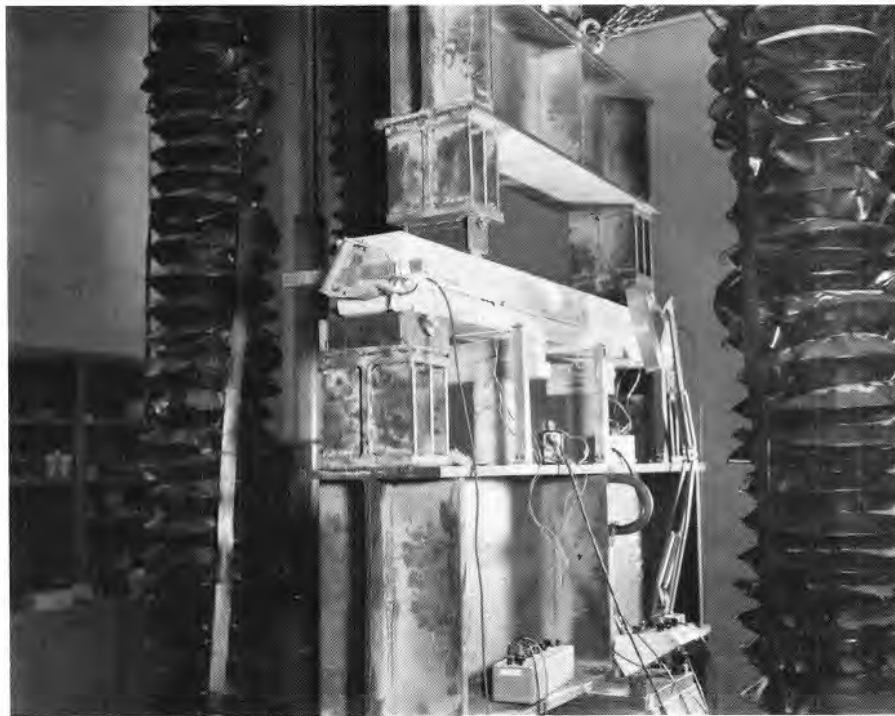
TEST OF LARGE BEAM SPECIMEN
